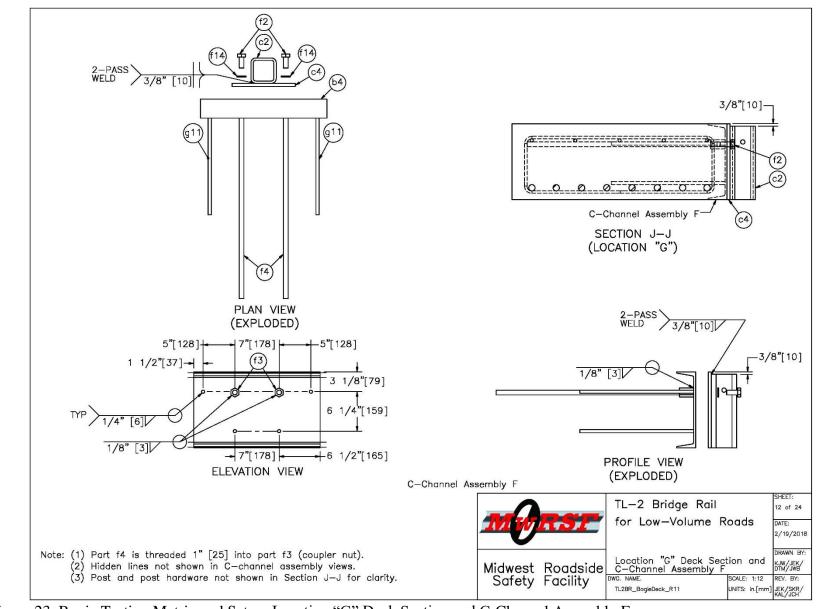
Bogie Testing Matrix and Setup, Location "G" Deck Section and C-Channel Assembly F
